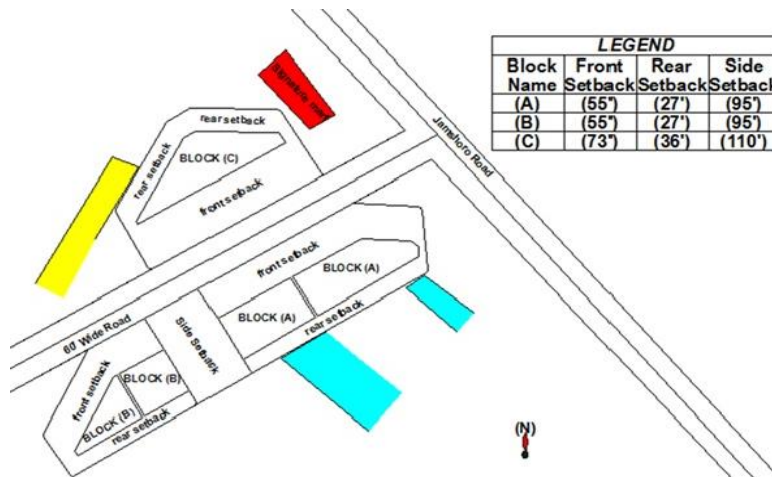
View of blocks in a building with standardized horizontal distance and front façade
